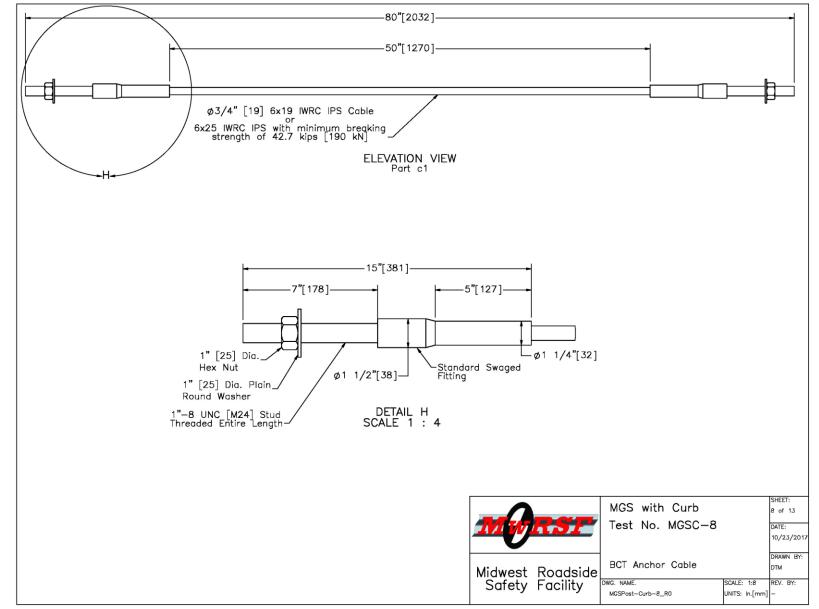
BCT Anchor Cable, Test No. MGSC-8
